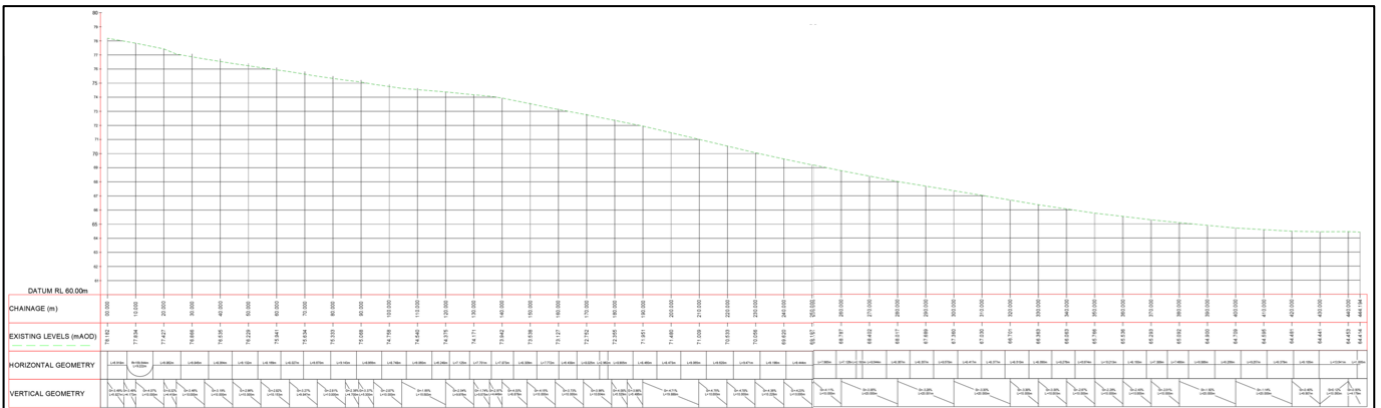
Existing Ground Elevation Profile of Drummin Lane – Exit of N11
